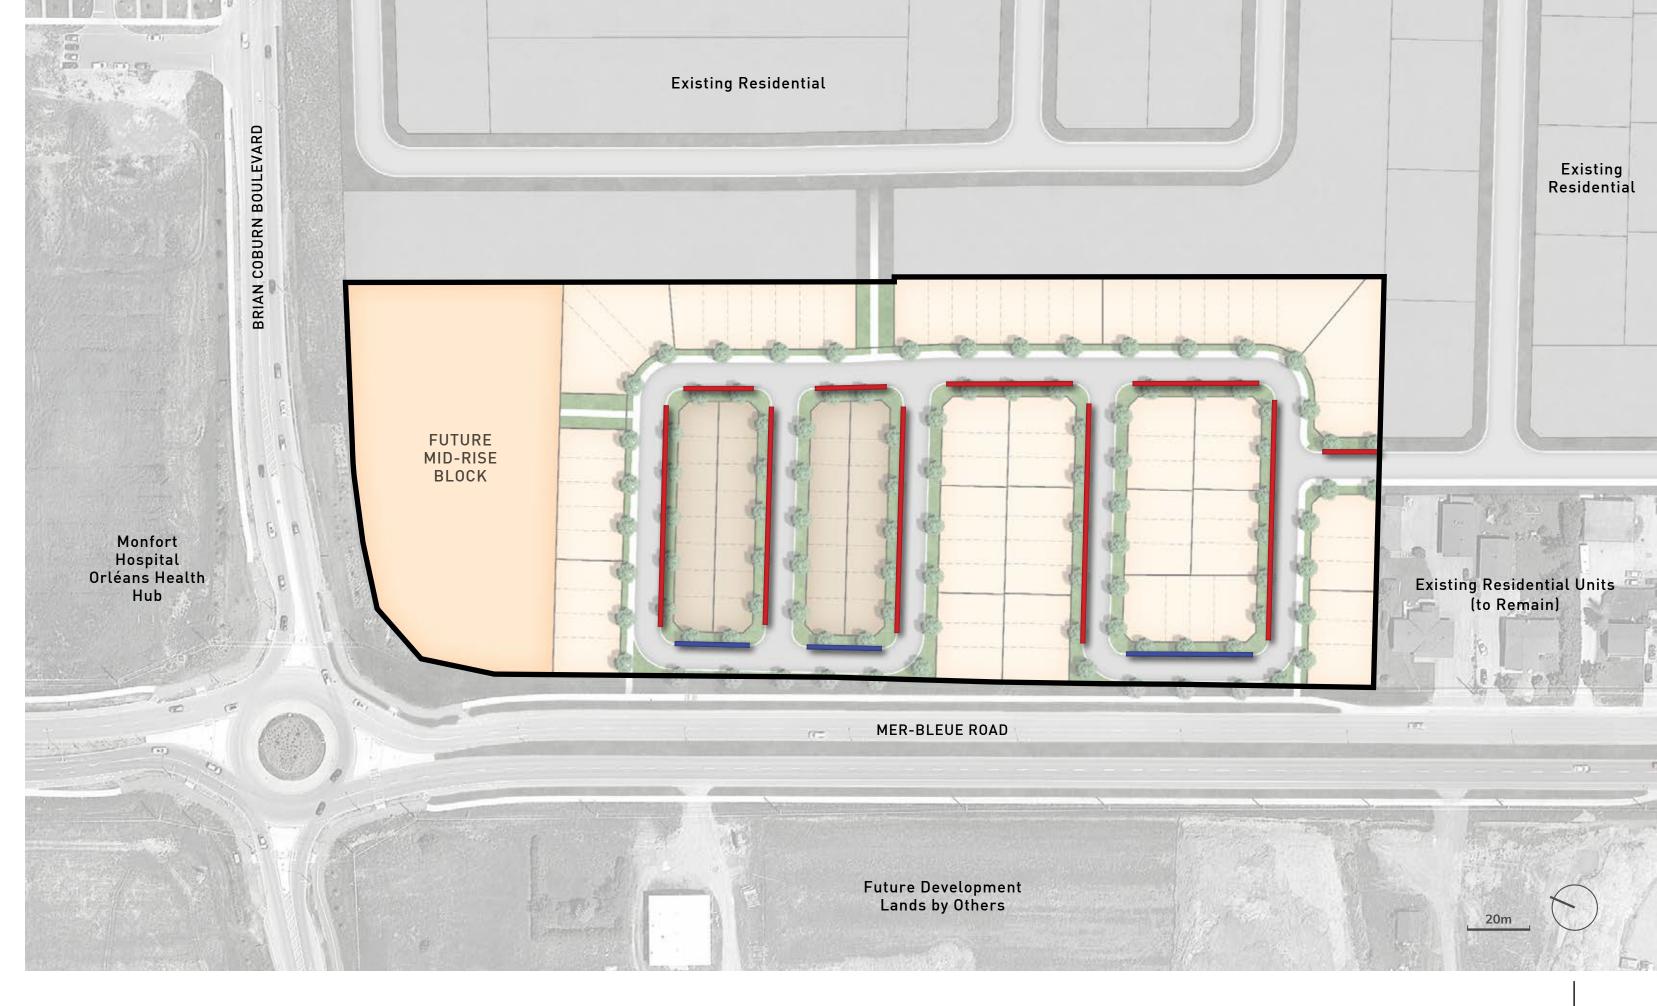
Front-Drive Townhomes Parking Demonstration on Local Road
